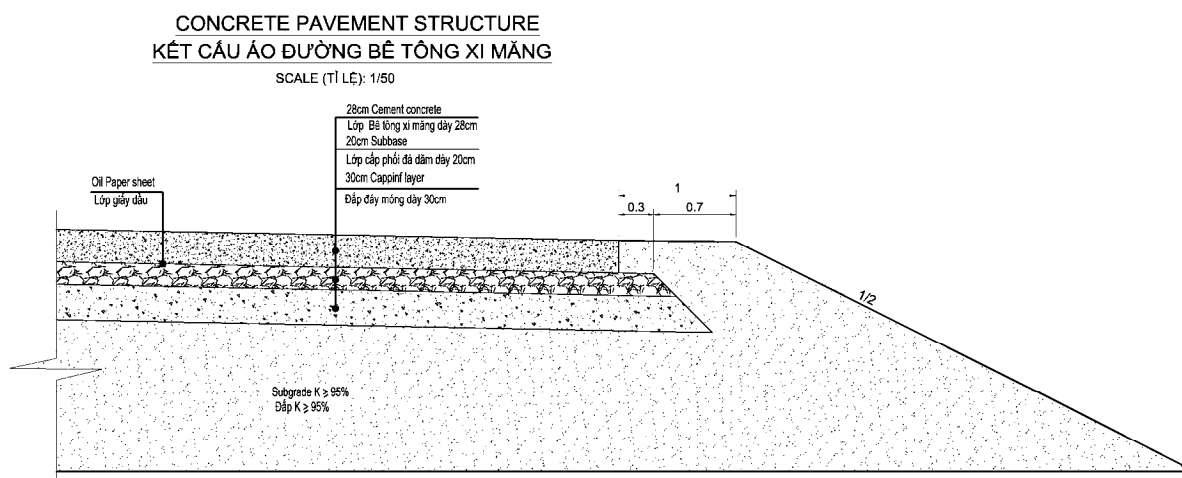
Concrete Pavement Structure for Toll Plaza Areas
